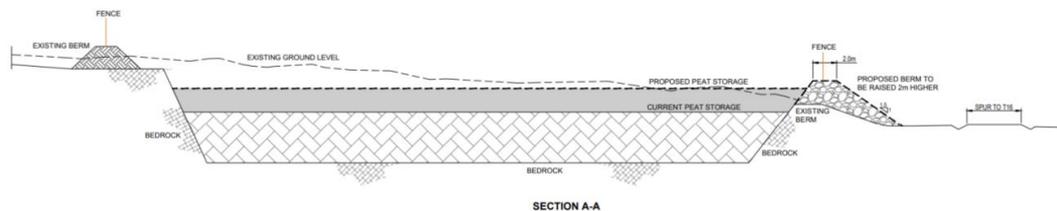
Cross Section of borrow pit between Turbine 13 and Turbine 16
